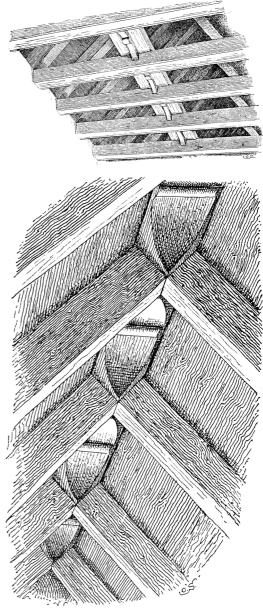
Reconstruction of the roofing in the church of Hagebyhöga in Östergötland with decorated steering plate and ridge purlin. From Janse (1902).
